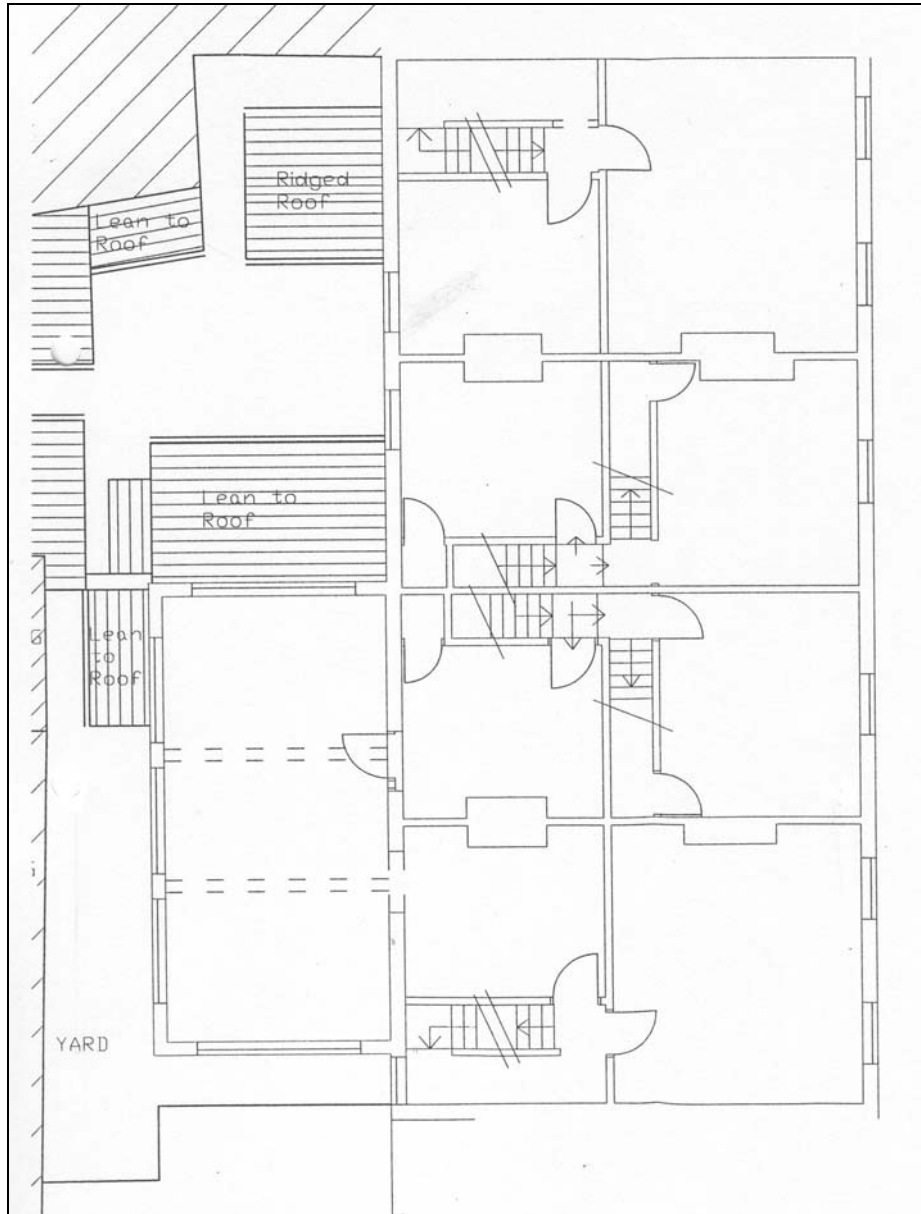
Plan of first floor. Corporate Architecture Ltd.
